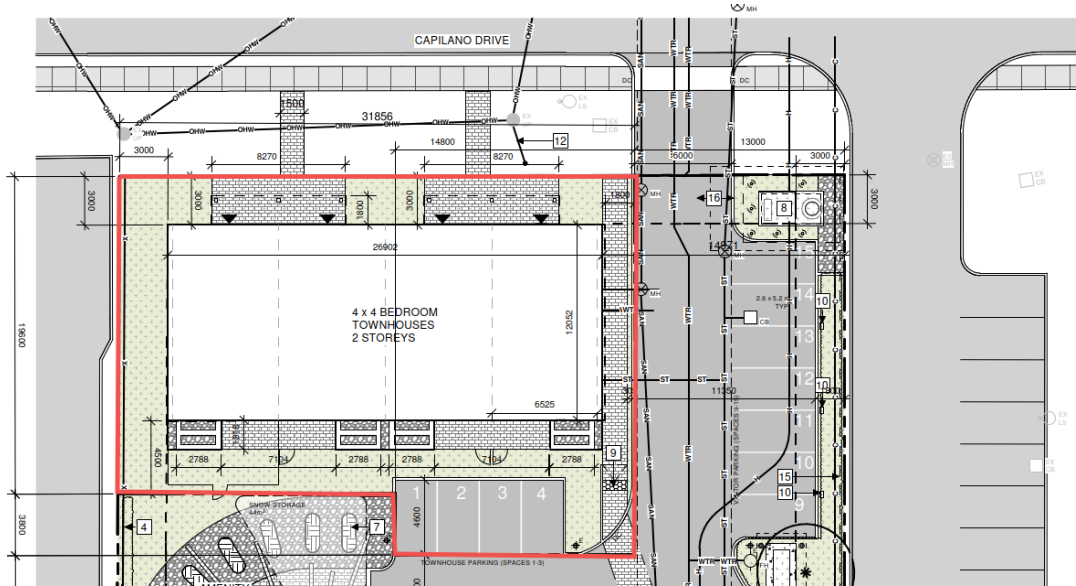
Excerpt of the 2024 Site Plan for 56 Capilano Drive. 58 Capilano Drive is indicated in red (Source: CSV Architects).
